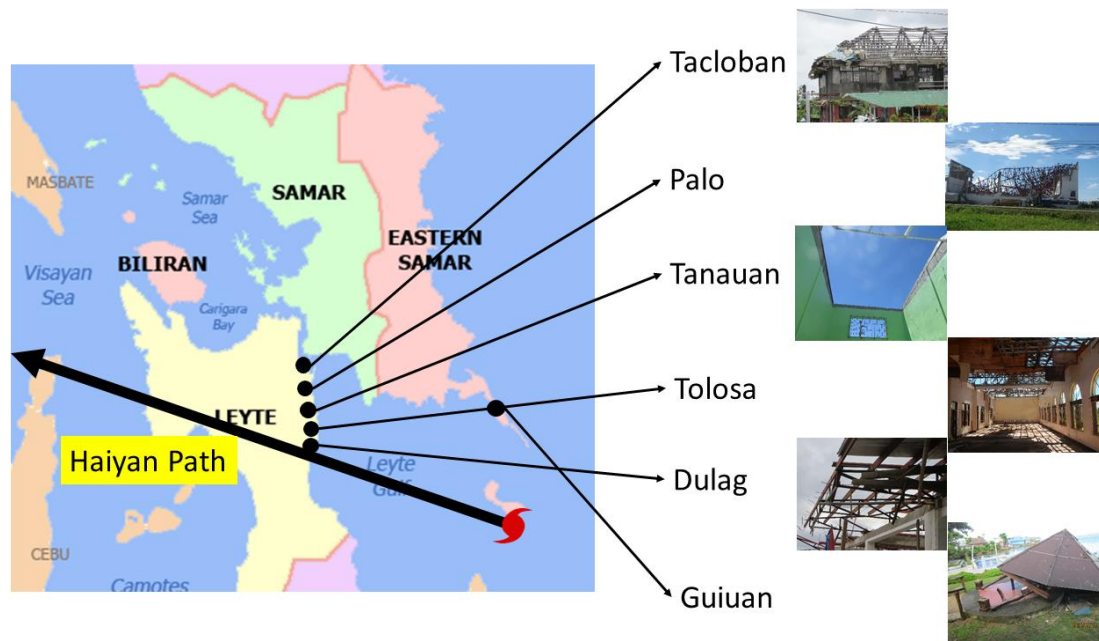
Study areas in Leyte and East Samar: Tacloban, Palo, Tanauan, Tolosa, Dulag and Guiuan.
